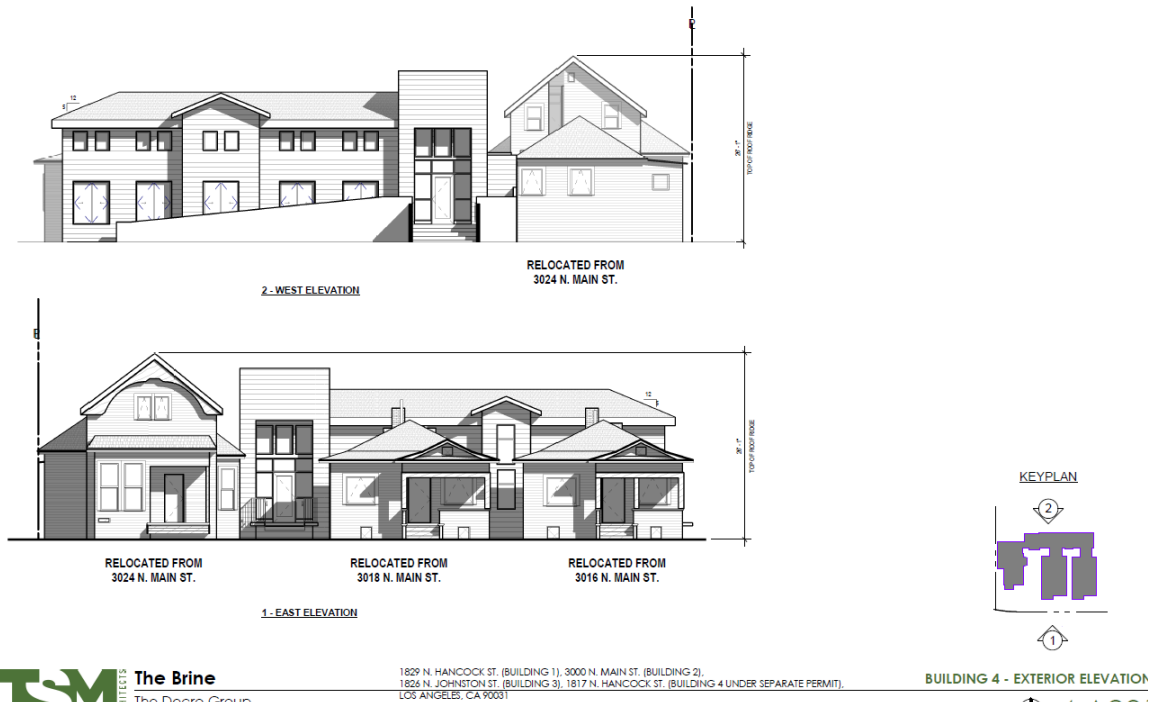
Schematic/Design Development, TSM Architects; West & East elevations; February 2020
